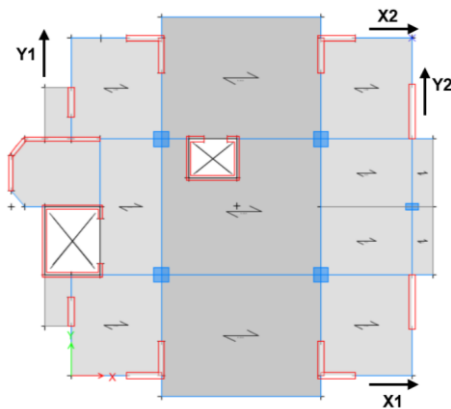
Typical plan of structural model without dissipators developed in ETABS
